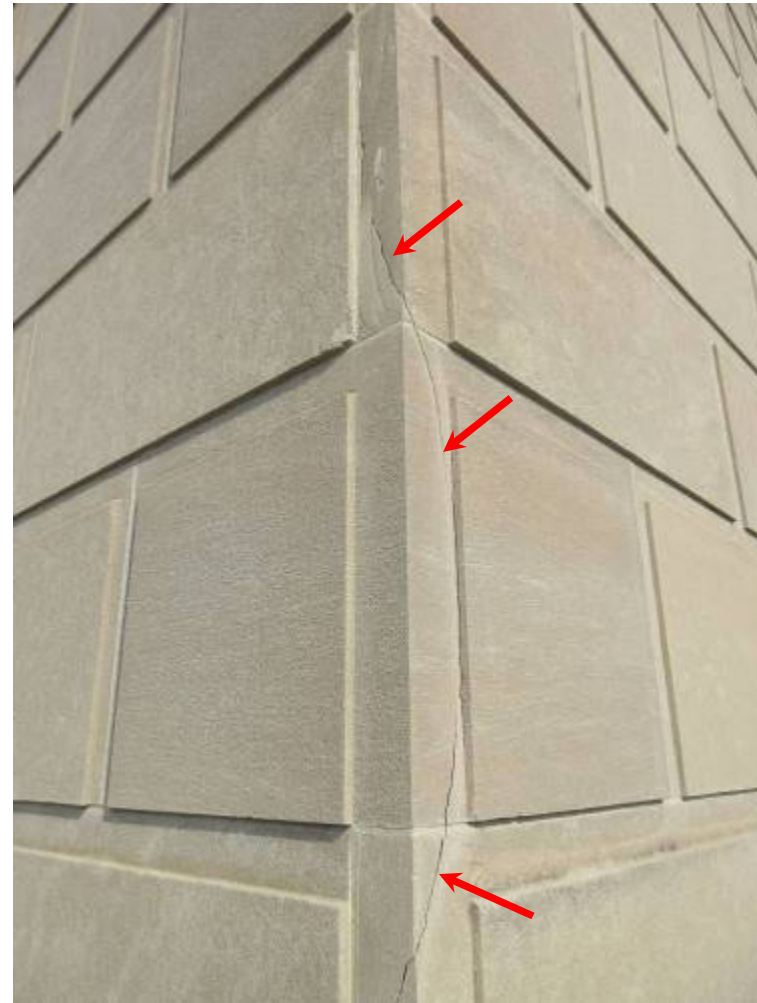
Cracked stones at the seventh floor at the southeast corner.
